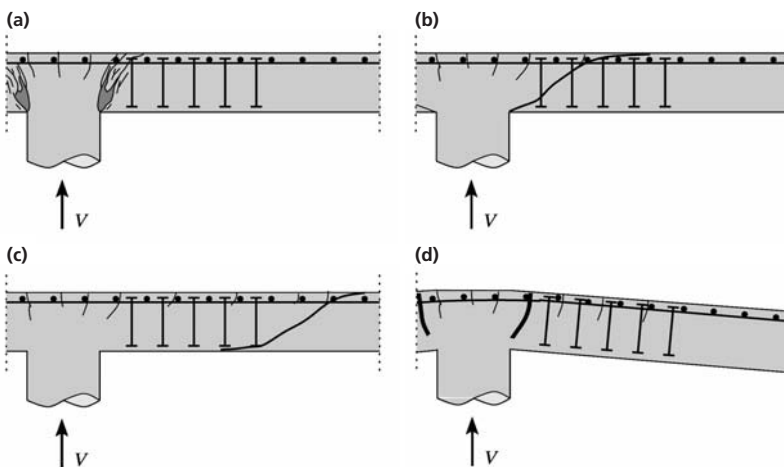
Failure modes for a slab with punching shear reinforcement: (a) crushing of first concrete strut; (b) punching within the shear-reinforced zone; (c) punching outside the shear-reinforced zone; and (d) flexural failure.
